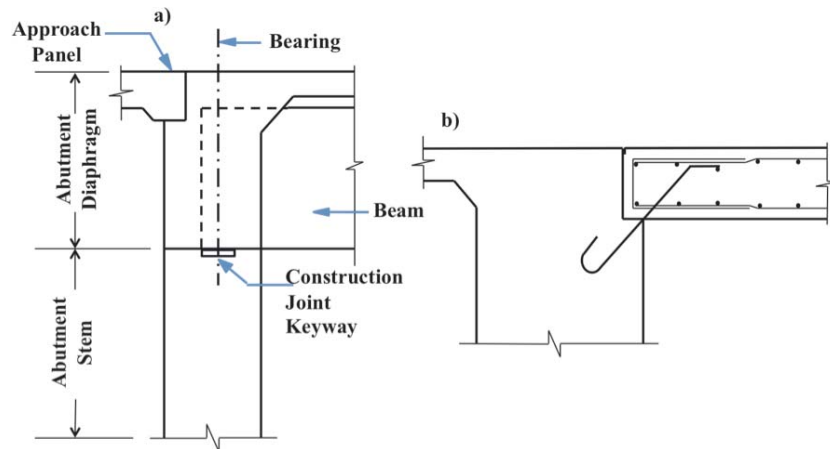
Illustrations of a) an integral abutment and b) an approach slab tied with the integral abutment at paving notch.
